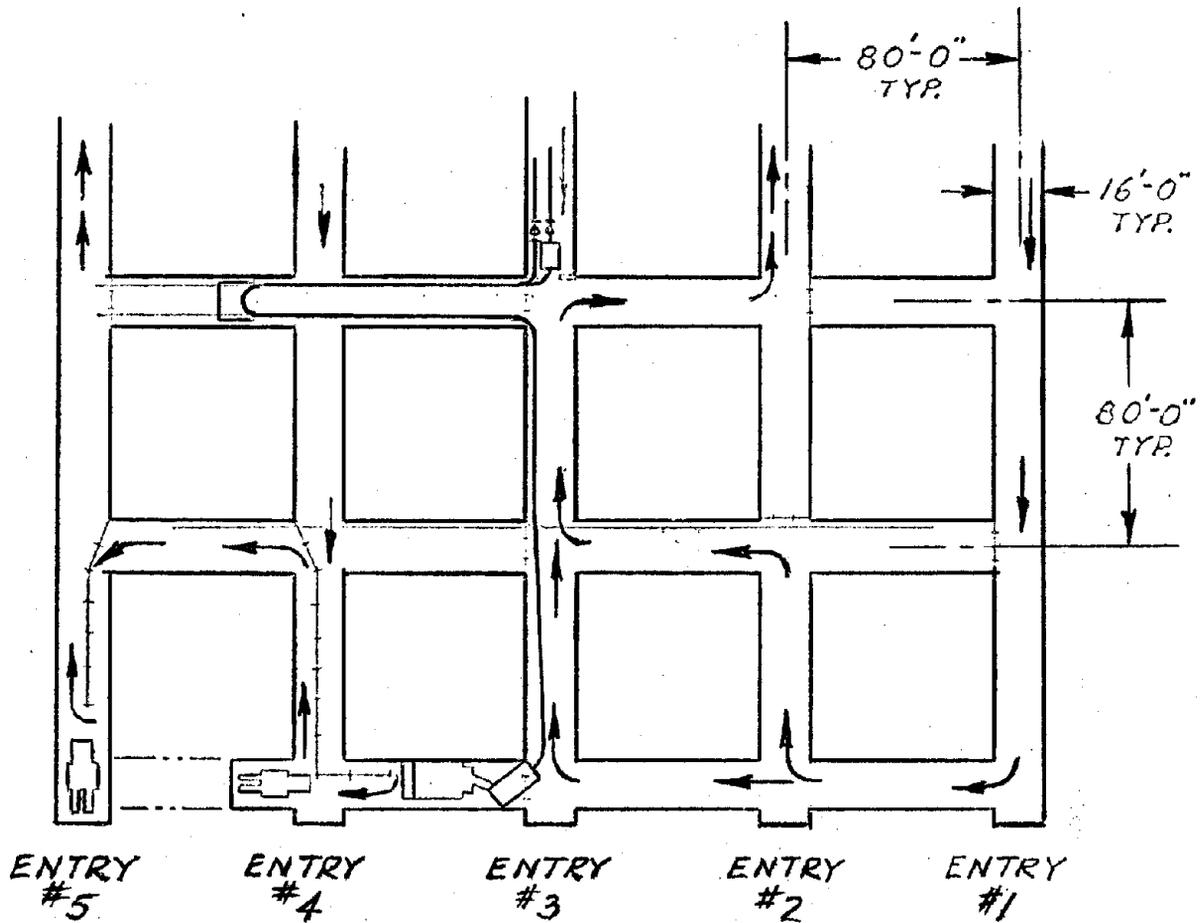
Mine Plan; Last Cut in Entry No. 3
